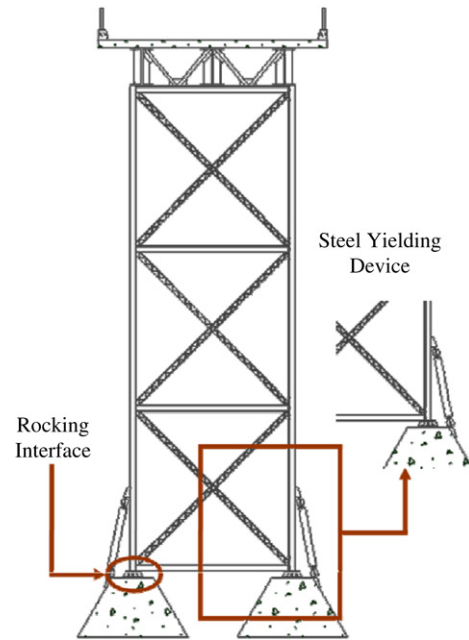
Retrofitted bridge steel-truss pier using controlled rocking approach.
